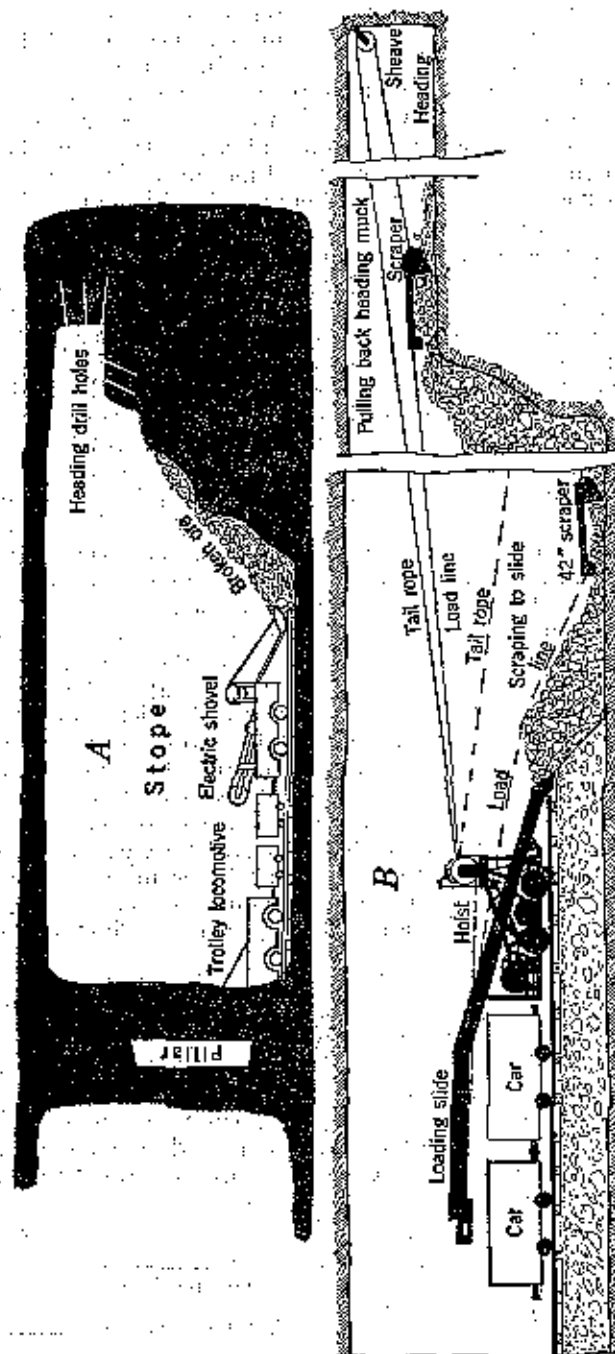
Fowler loading: A, Special-type electric shovel loading into cars; southeast Missouri; B, scraper loading from heading and bench. (After St. Louis Tower Shovel Co.)
